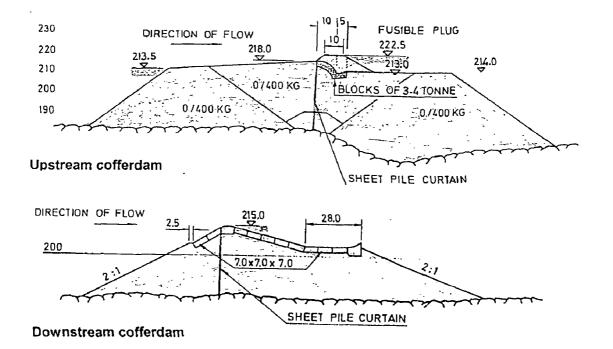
Cabora Bassa – Cross section of upstream and downstream cofferdams
